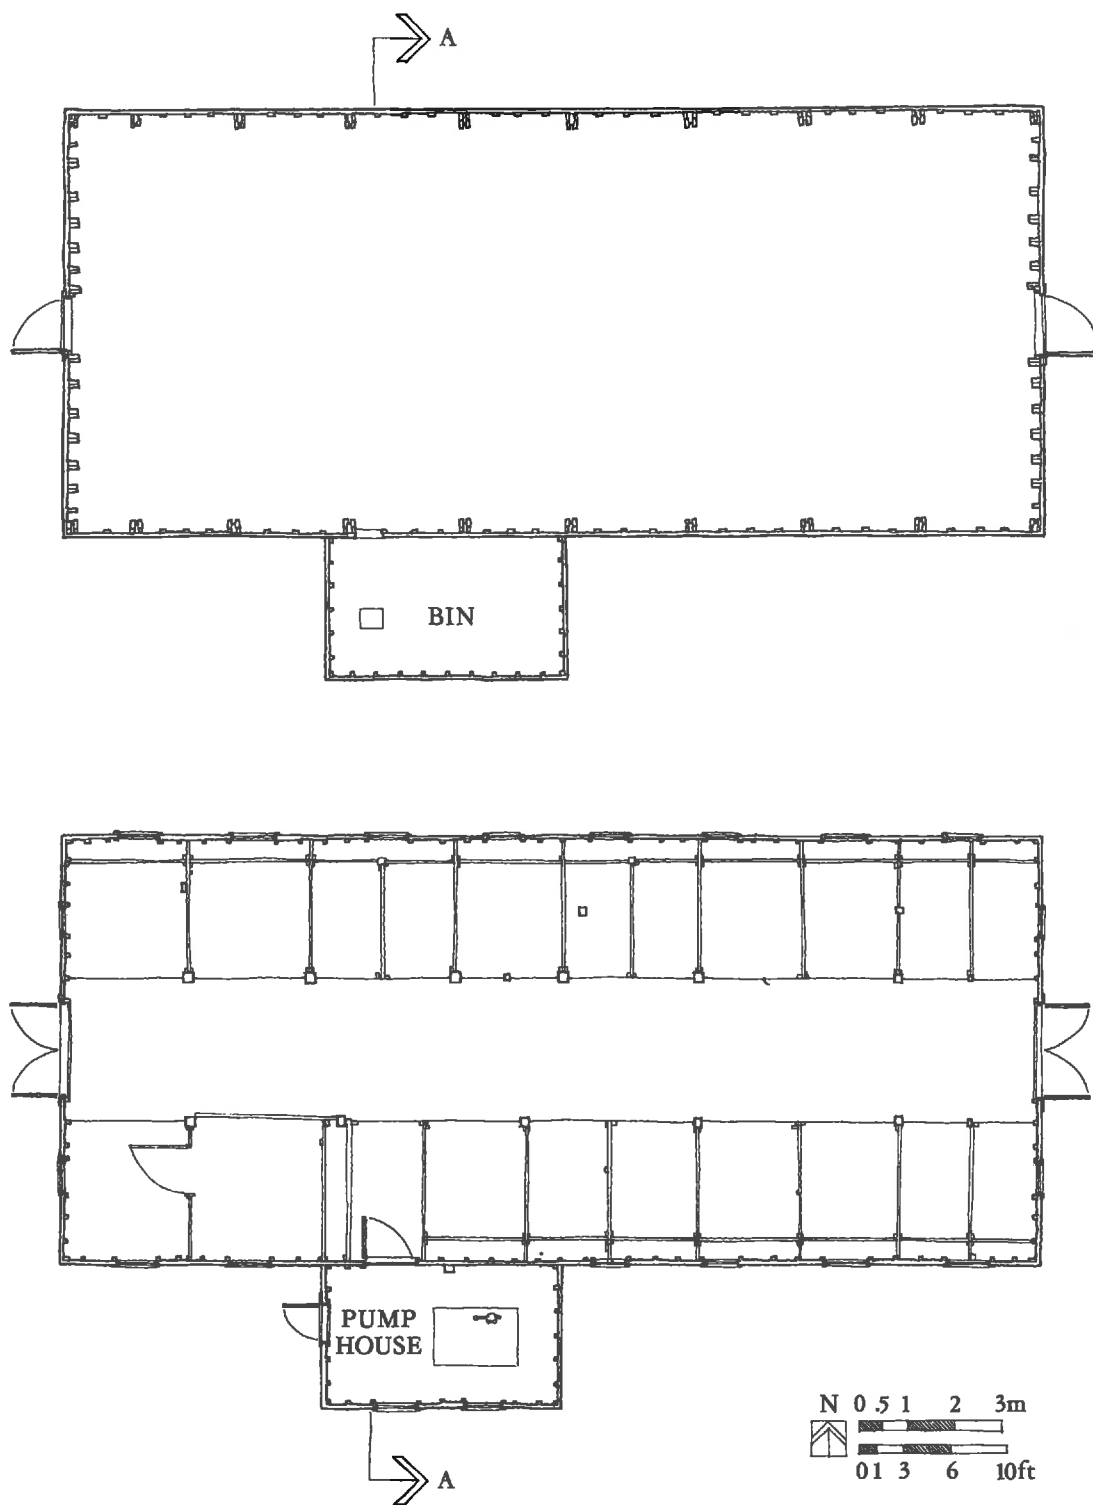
Top, loft plan, and below, stable plan of the Jenkins barn.
